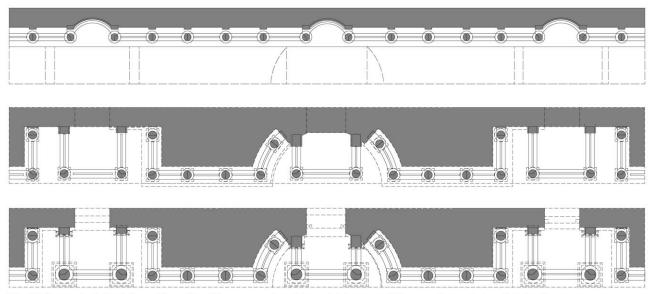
Reconstructed architrave-frieze plan of the scaenae frons (above, third story; middle, second story; below, first story)
